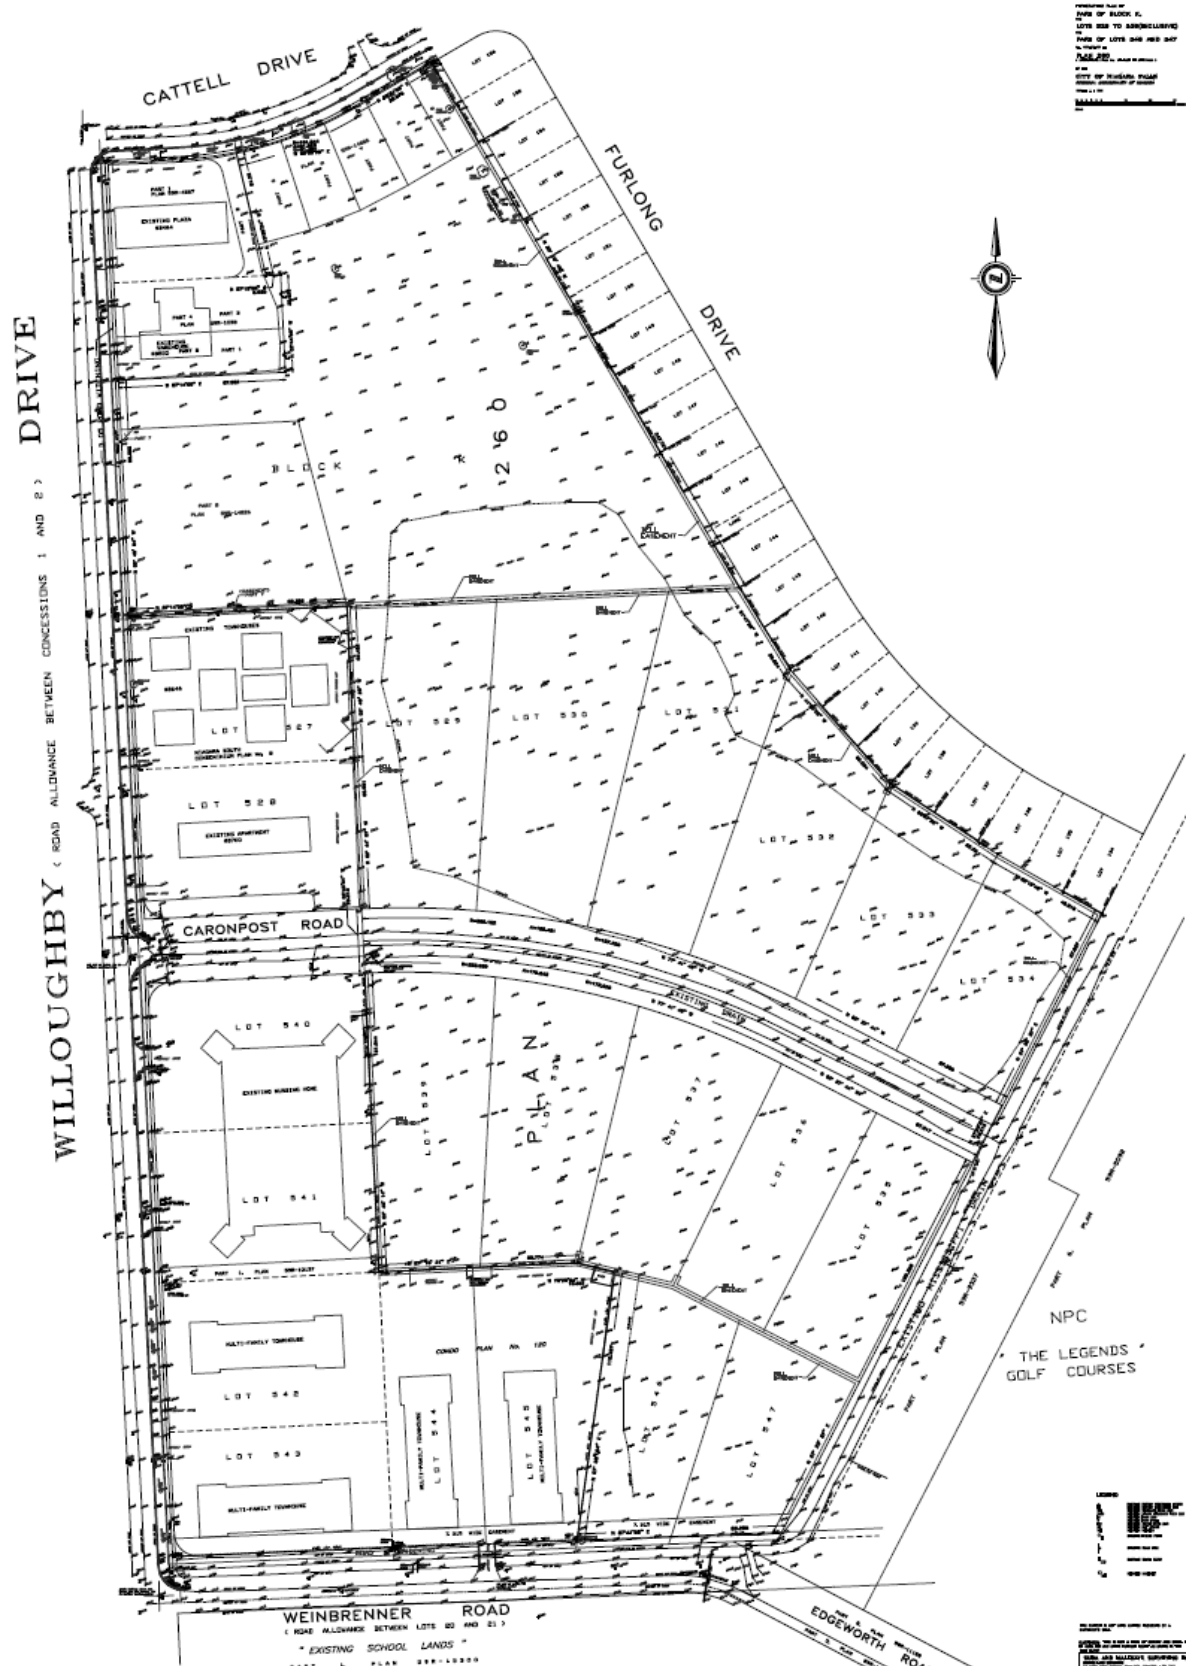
Subject Property, consisting of 14 individual lots, as shown on Plan 260
